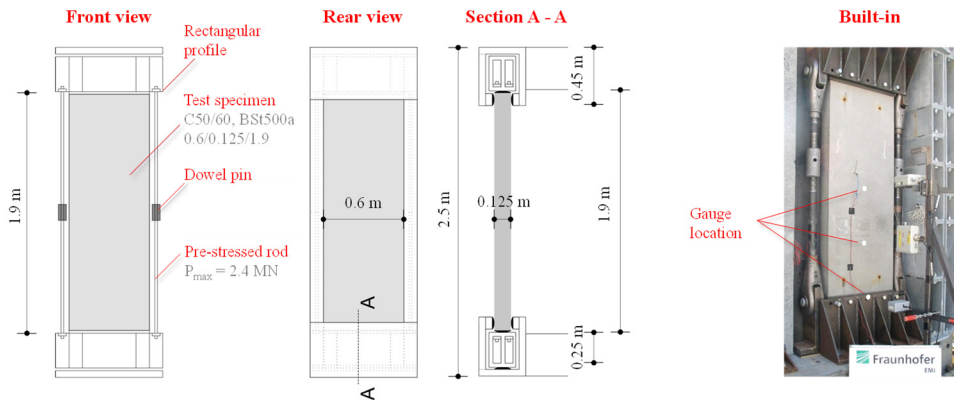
Test set-up for RC-walls under combined loading as construction detail (left) and in built-in state (right).
